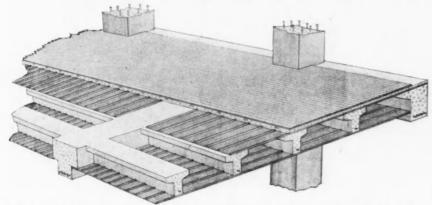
DETAILS OF METHOD USED ON THE NEW TWELVE-STORY BUILDING TO HOUSE THE FEDERAL TRADE COMMISSION IN WASHINGTON
